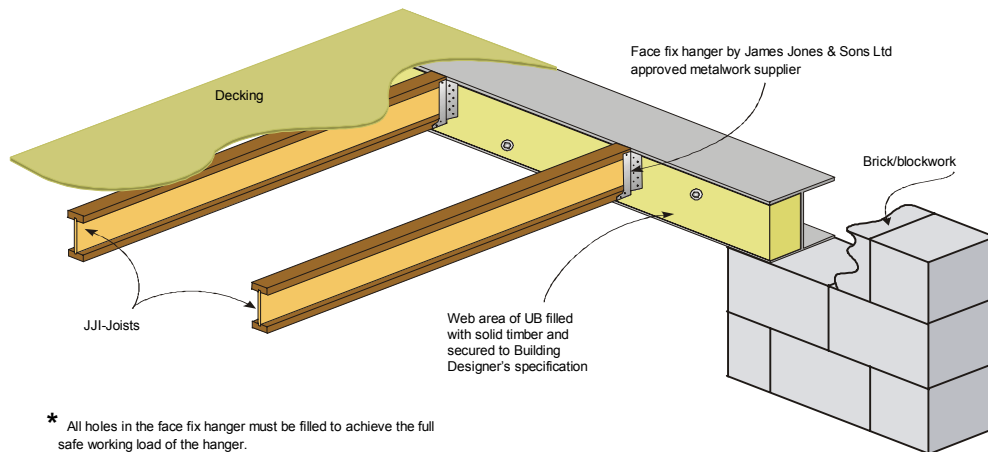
JJI-Joist to Steel beam connection using Face Fix Hangers
